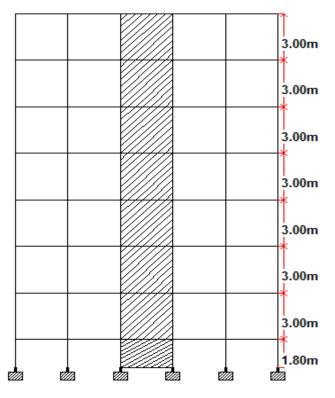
Elevation of a steel frame building with SPSW(Strip frame model)
